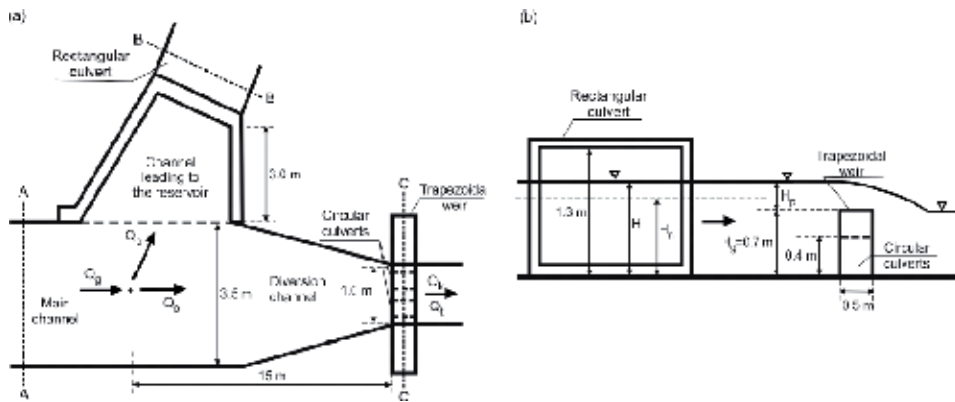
Plan and longitudinal section of a rectangular culvert and a trapezoidal weir [4]. (a) Plan of culvert and weir, and (b) Longitudinal section of culvert and weir.
